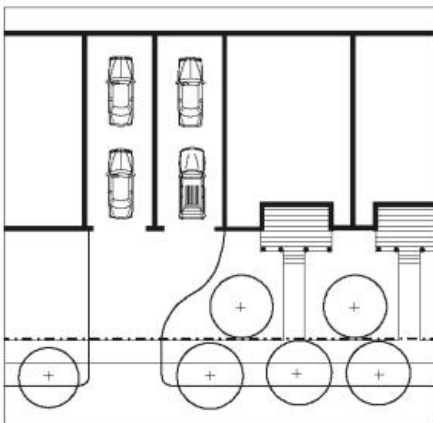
Figure Exception to 20.50.410(E)(2): Illustration of tandem parking.
